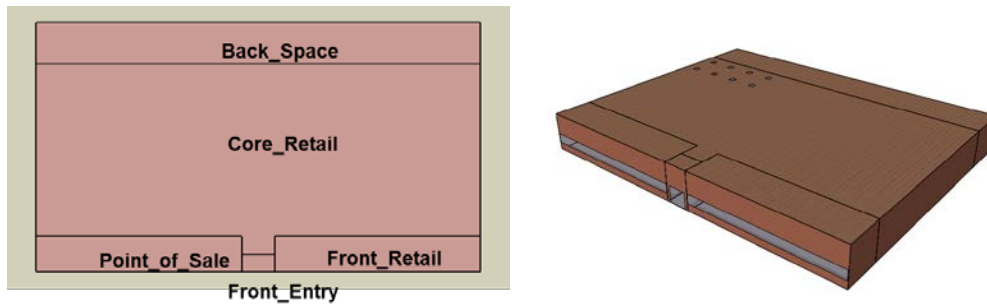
Floor Plan and Thermal Zones of the Stand-Alone Retail Building.
